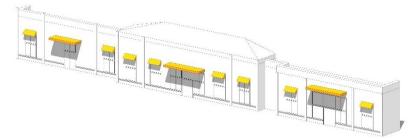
Outlot/Liner Commercial Building Type Awnings
